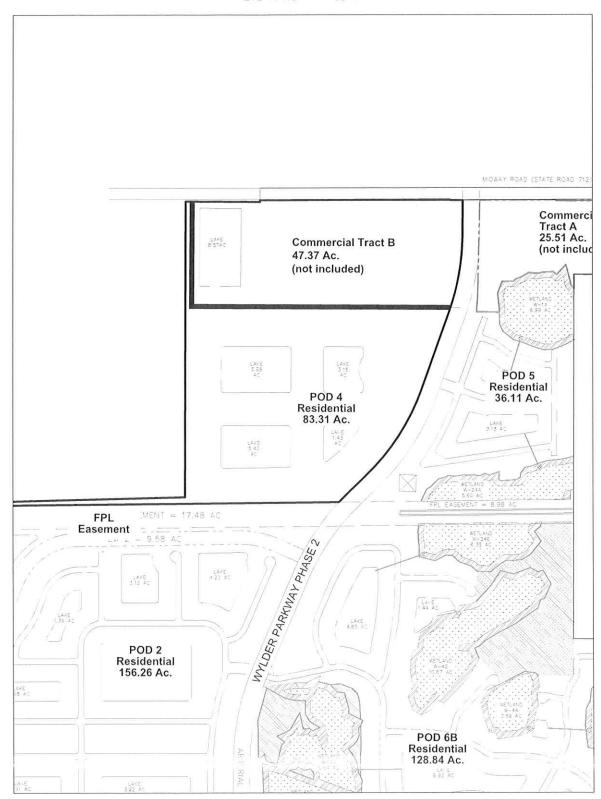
SITE PLAN LTC RANCH - POD 2
